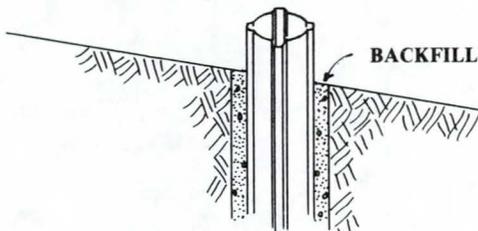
INCLINOMETER — Detail at surface
